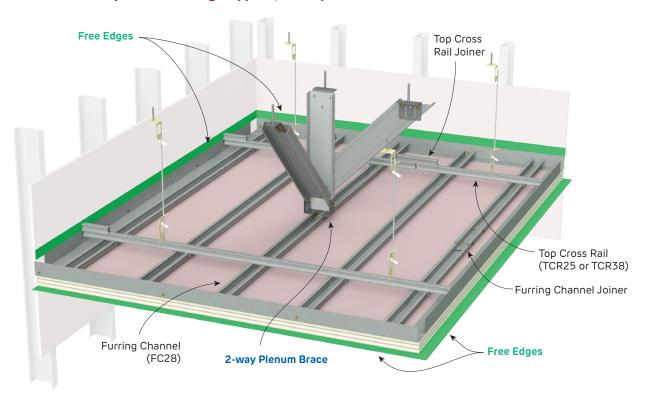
Suspended Ceiling Frame - Type C, 2-way Plenum Braced 2-way Plenum Brace with four sides Free
